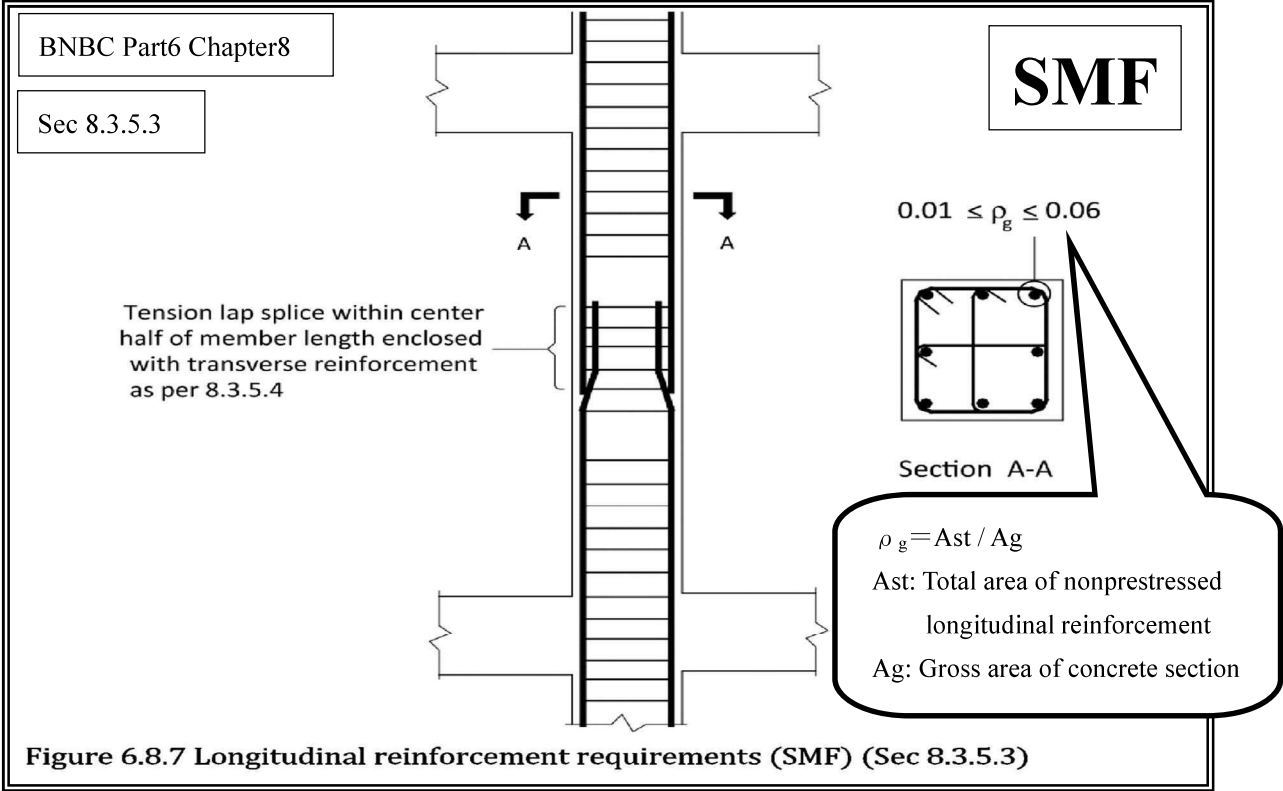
Longitudinal reinforcement requirements (SMF) (Sec 8.3.5.3)
